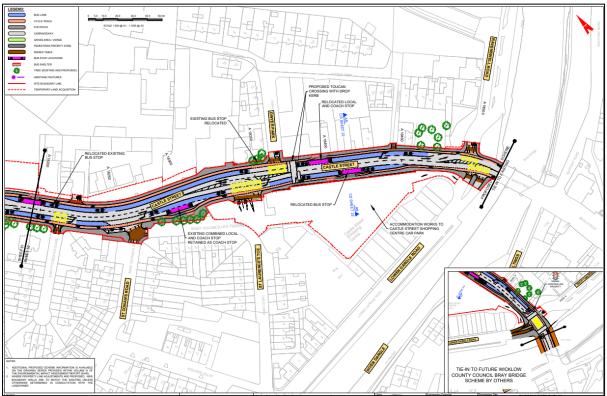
Extract from General Arrangement Drawing along Castle Street (Sheet 52)
